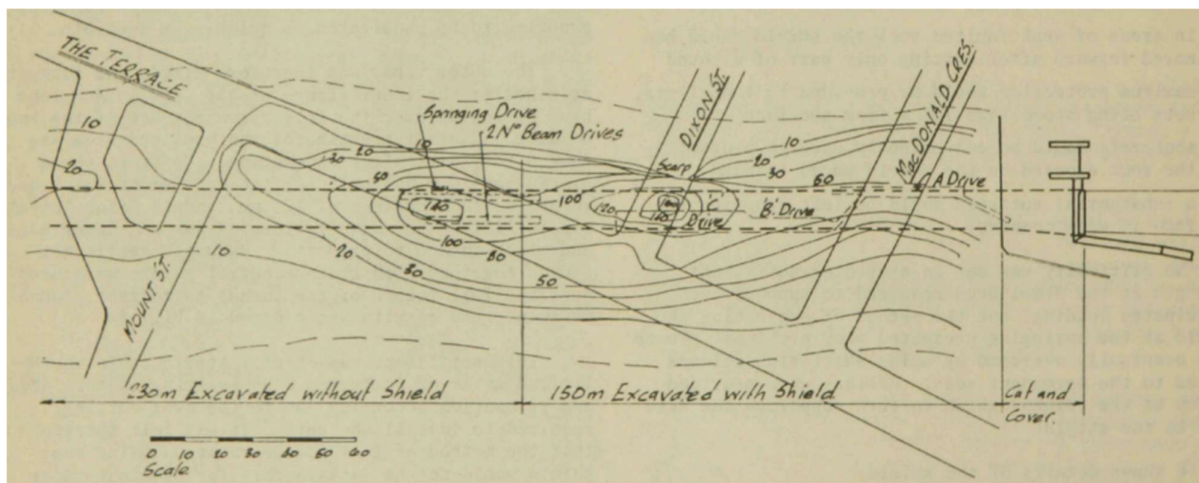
Contours of subsidence in the 1970s construction of the existing tunnel (Newsome, 1981)
